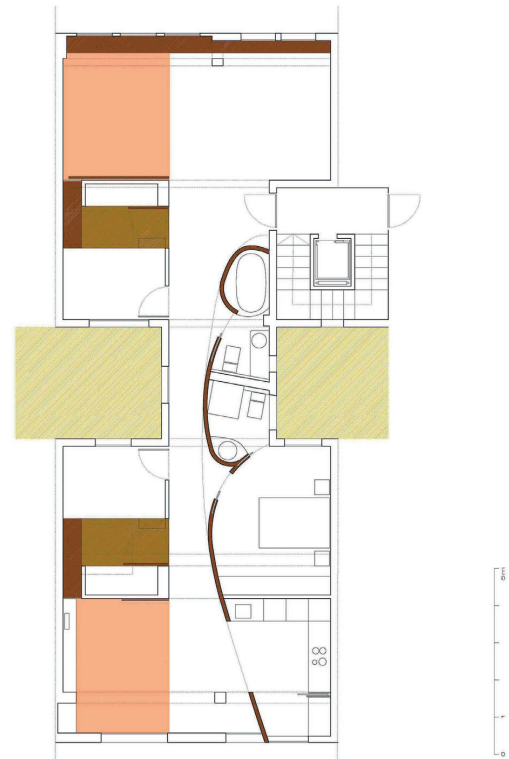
Site plan and architecture plant. 2019. Produced by authors / Figura 1. Planta de situación y planta de arquitectura. 2019. Producido por los autores.
